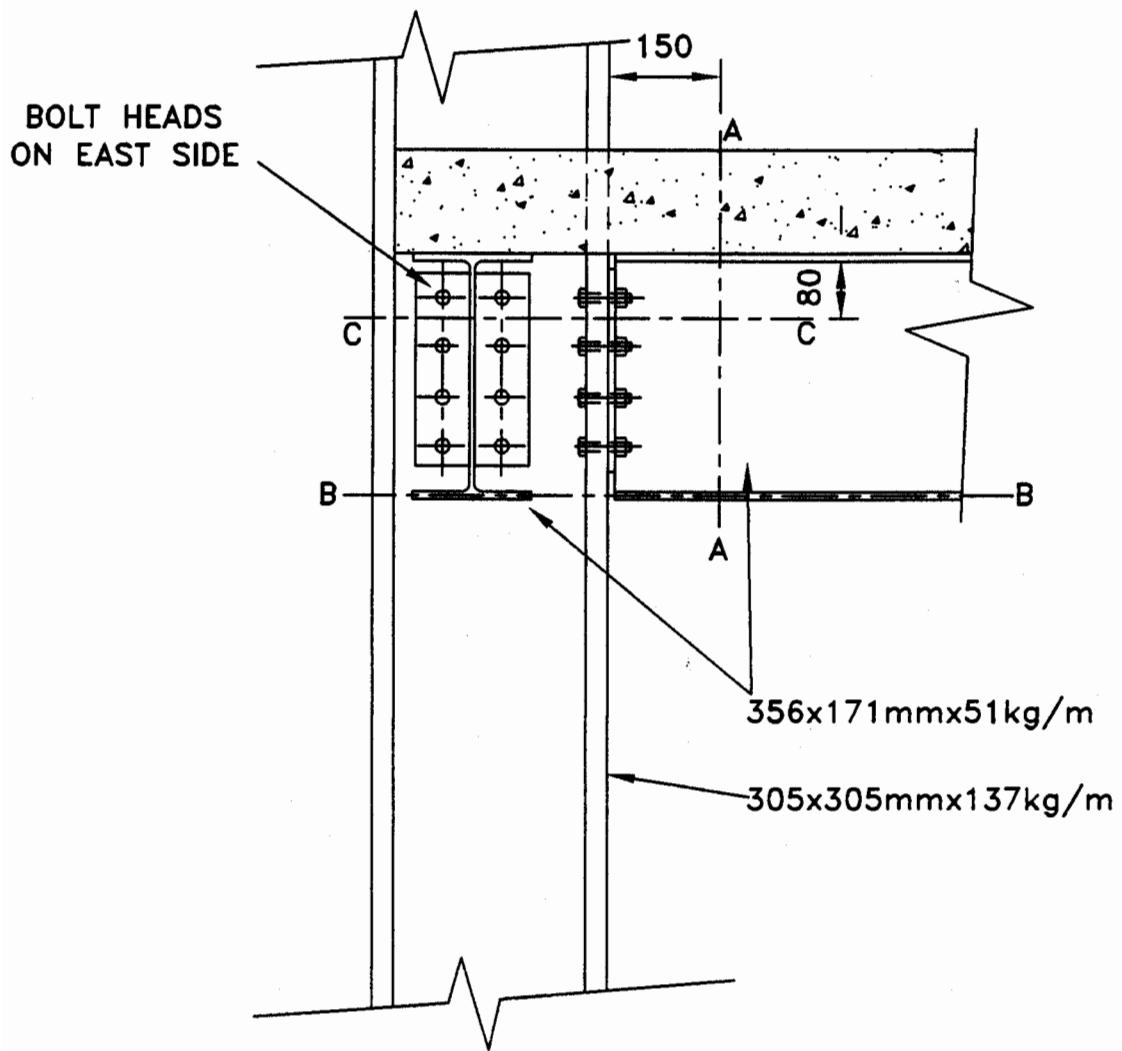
DETAIL AT FIN PLATE CONNECTION AT E-1/2
